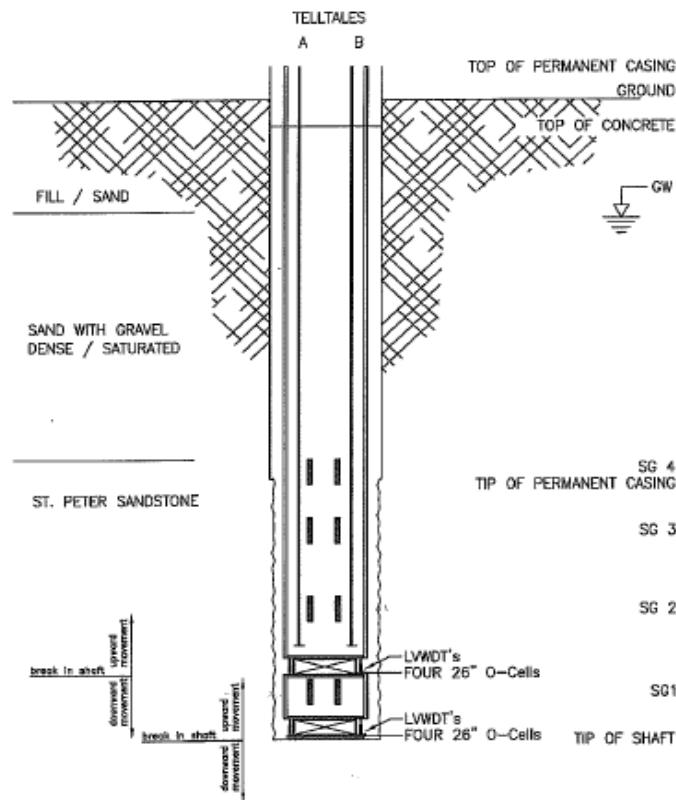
Test Shaft Arrangement (Loadtest, 2007)
